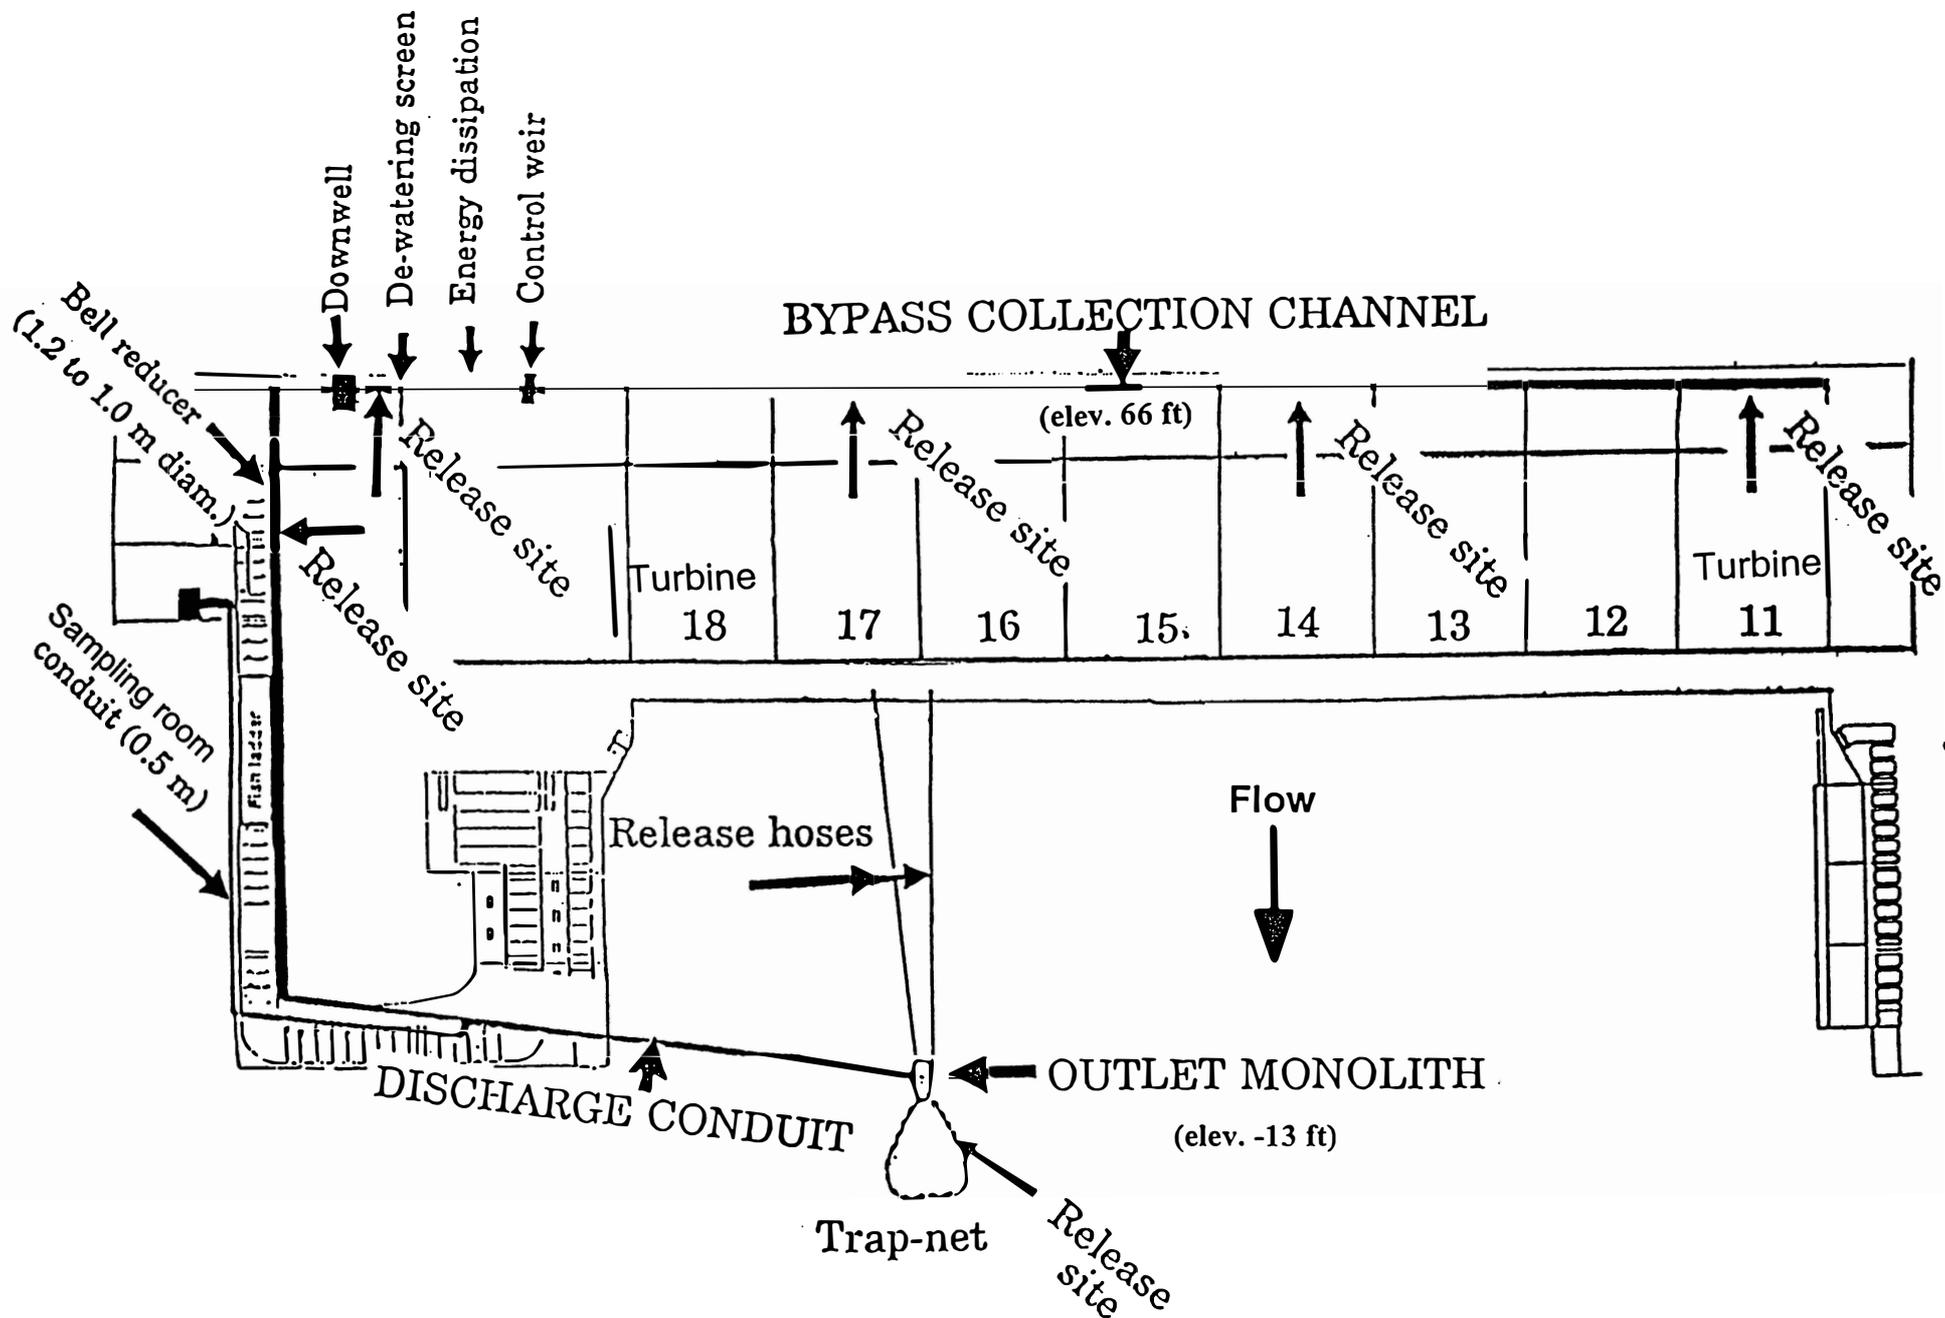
Plan view of the downstream migrant bypass system at Bonneville Dam Second Powerhouse indicating major features, fish release sites, and the trap-net location.
